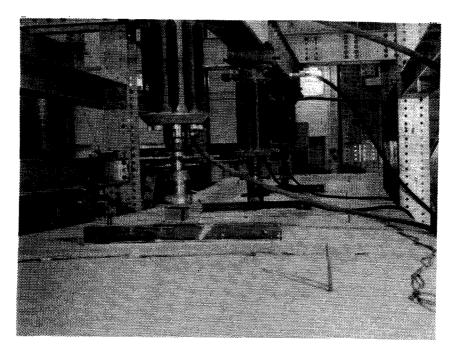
Overall View along Slab of Full-Size Stub-Girder after Failure (Notice amount of deflection)
